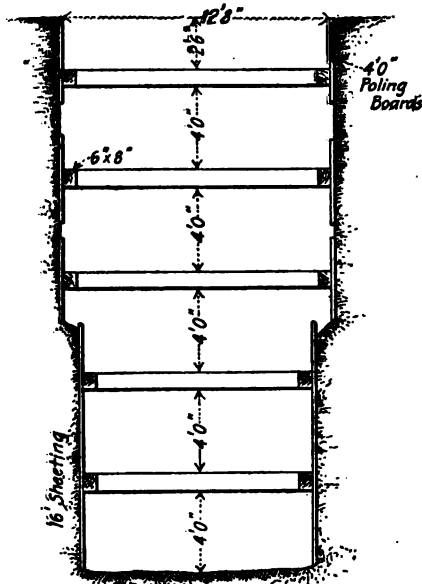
Poling boards and vertical sheeting for sewer 7 ft. 6 in. by 6 ft. 8 in.
